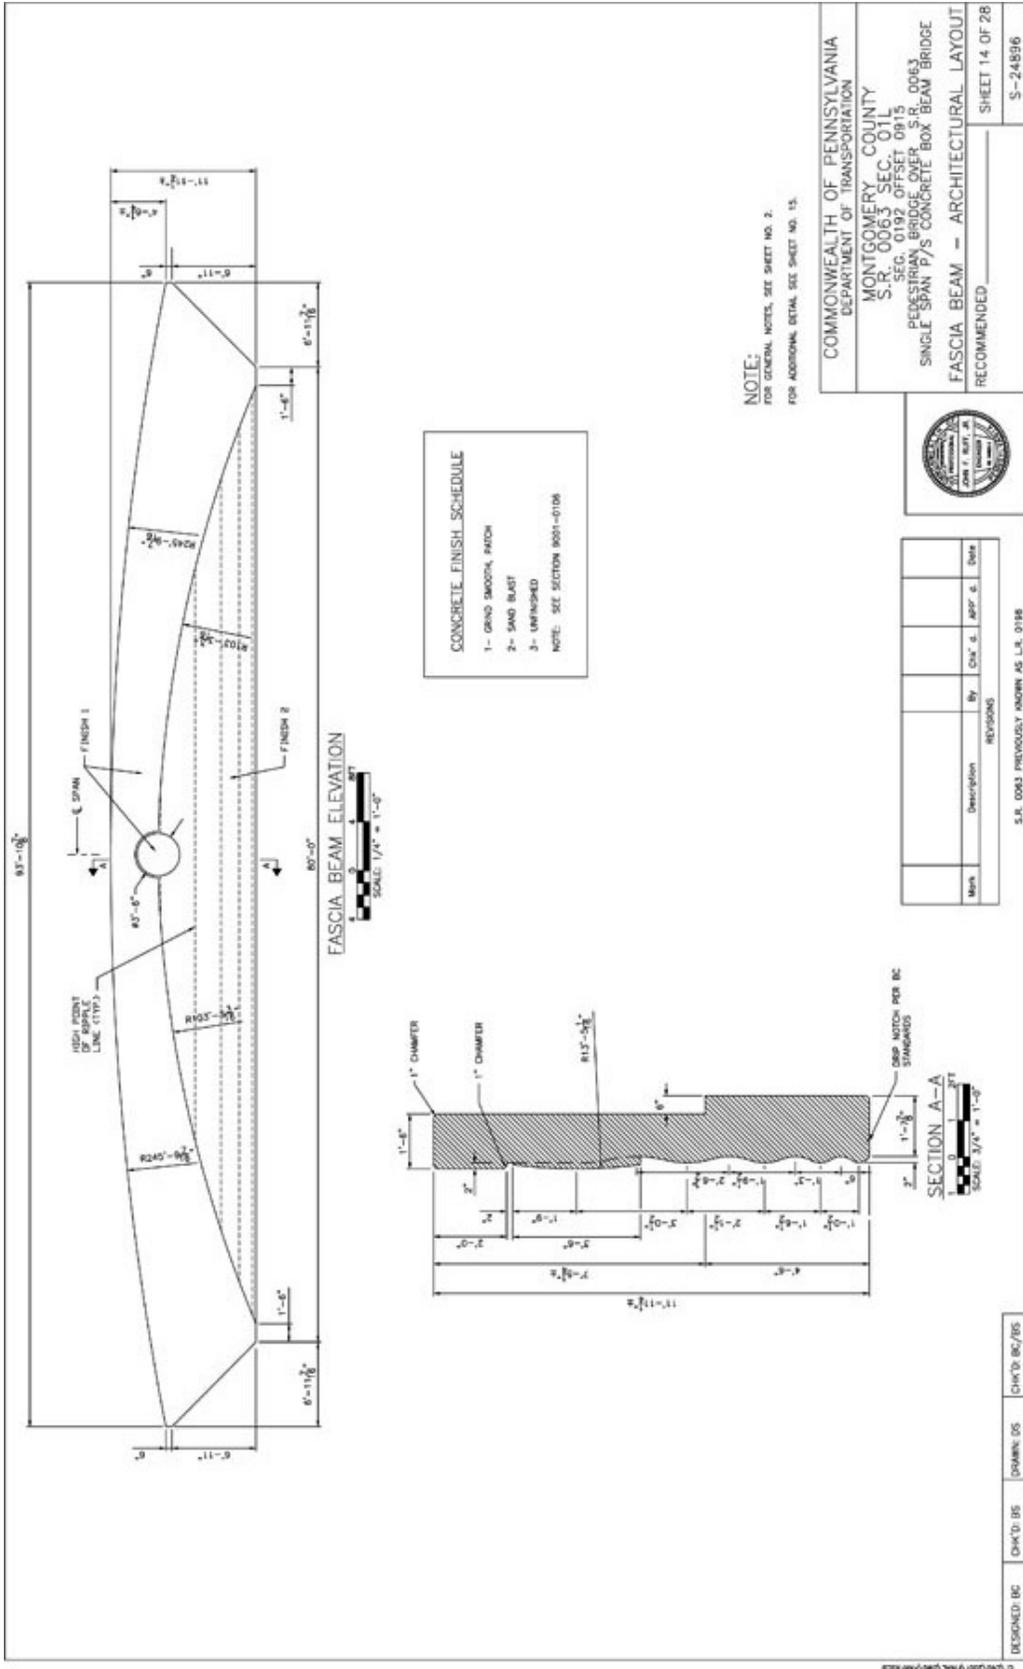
Landscape architect’s construction document for fascia beam architectural treatment.
